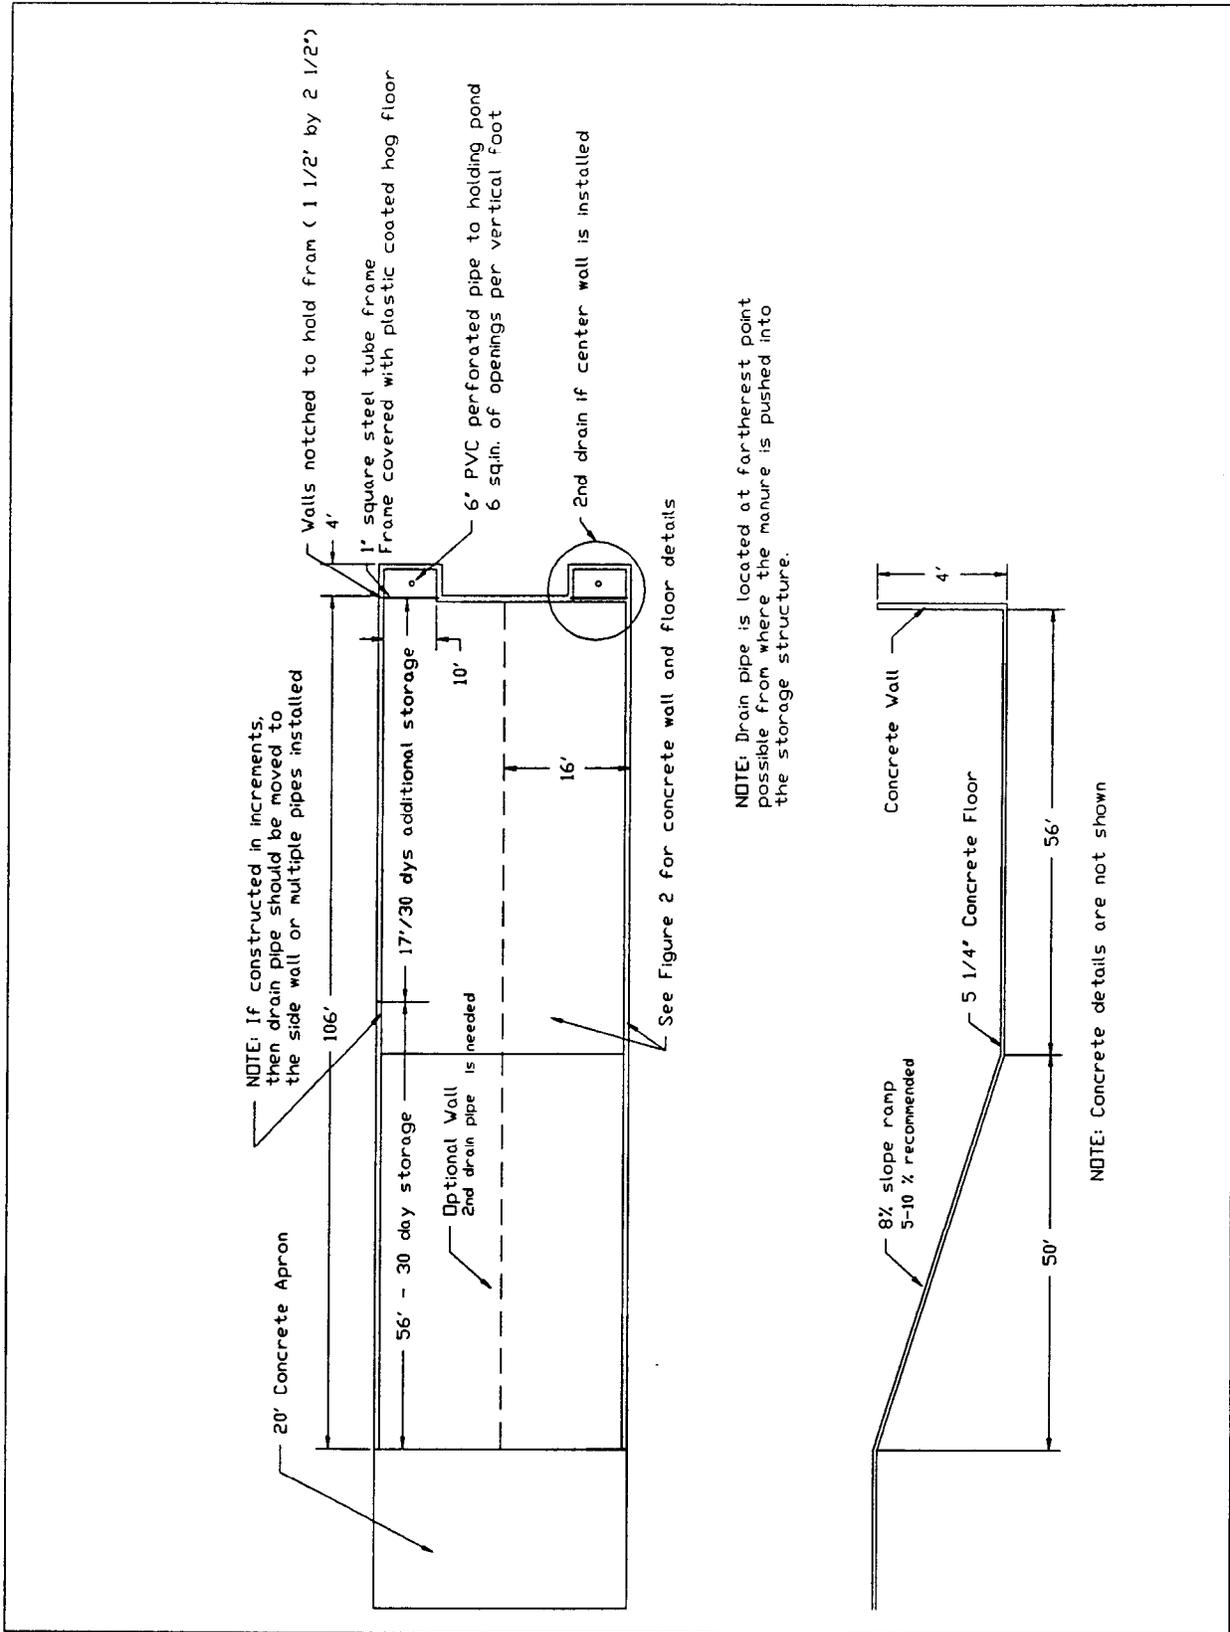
Concrete Sloping Ramp and Concrete Bottom Storage Structure
